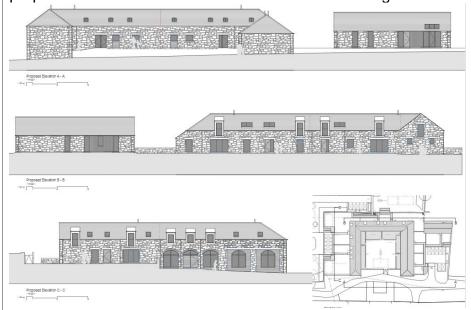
Proposed Elevations – plan submitted showing the proposed finished appearance of the steading and adjacent single dwelling.
